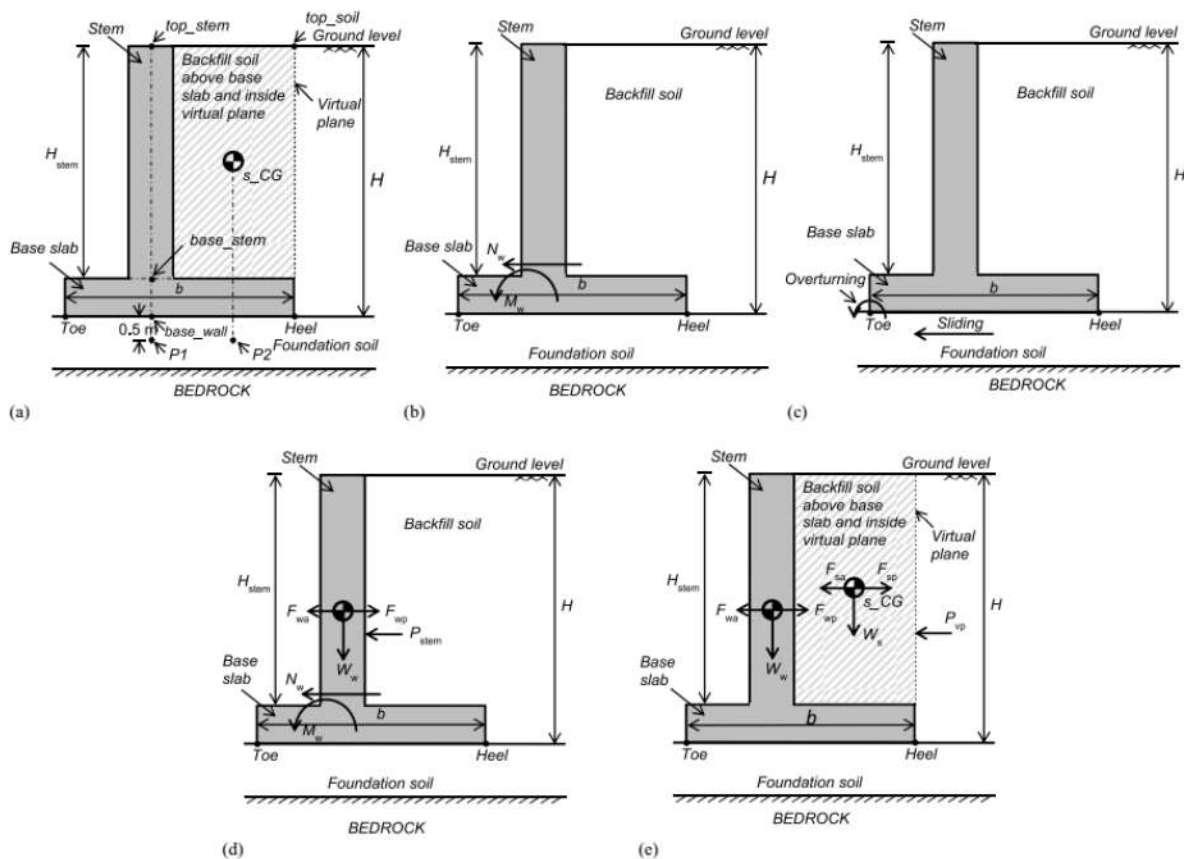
Typical cantilever-type retaining wall–soil system (Bakr and Ahmad (2019)).
